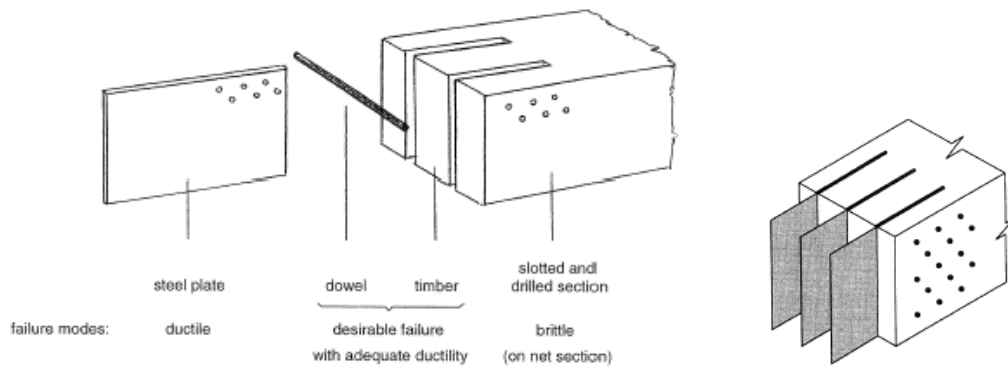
Detail of multiple shear steel to timber connection from Madsen (2000)
